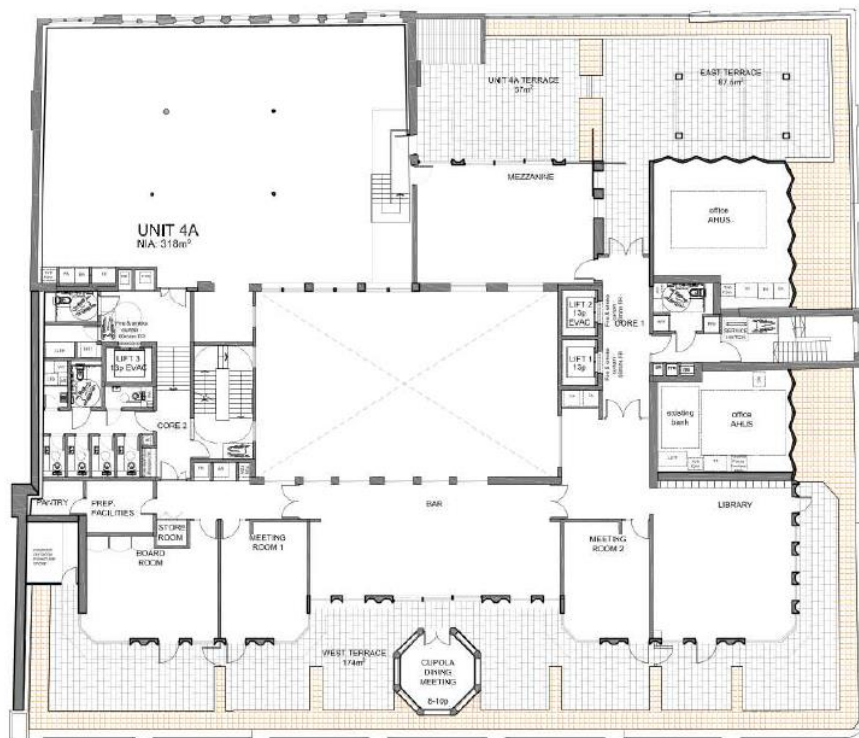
Proposed fourth floor plan showing roof extension plus related amenity and landscaped areas
